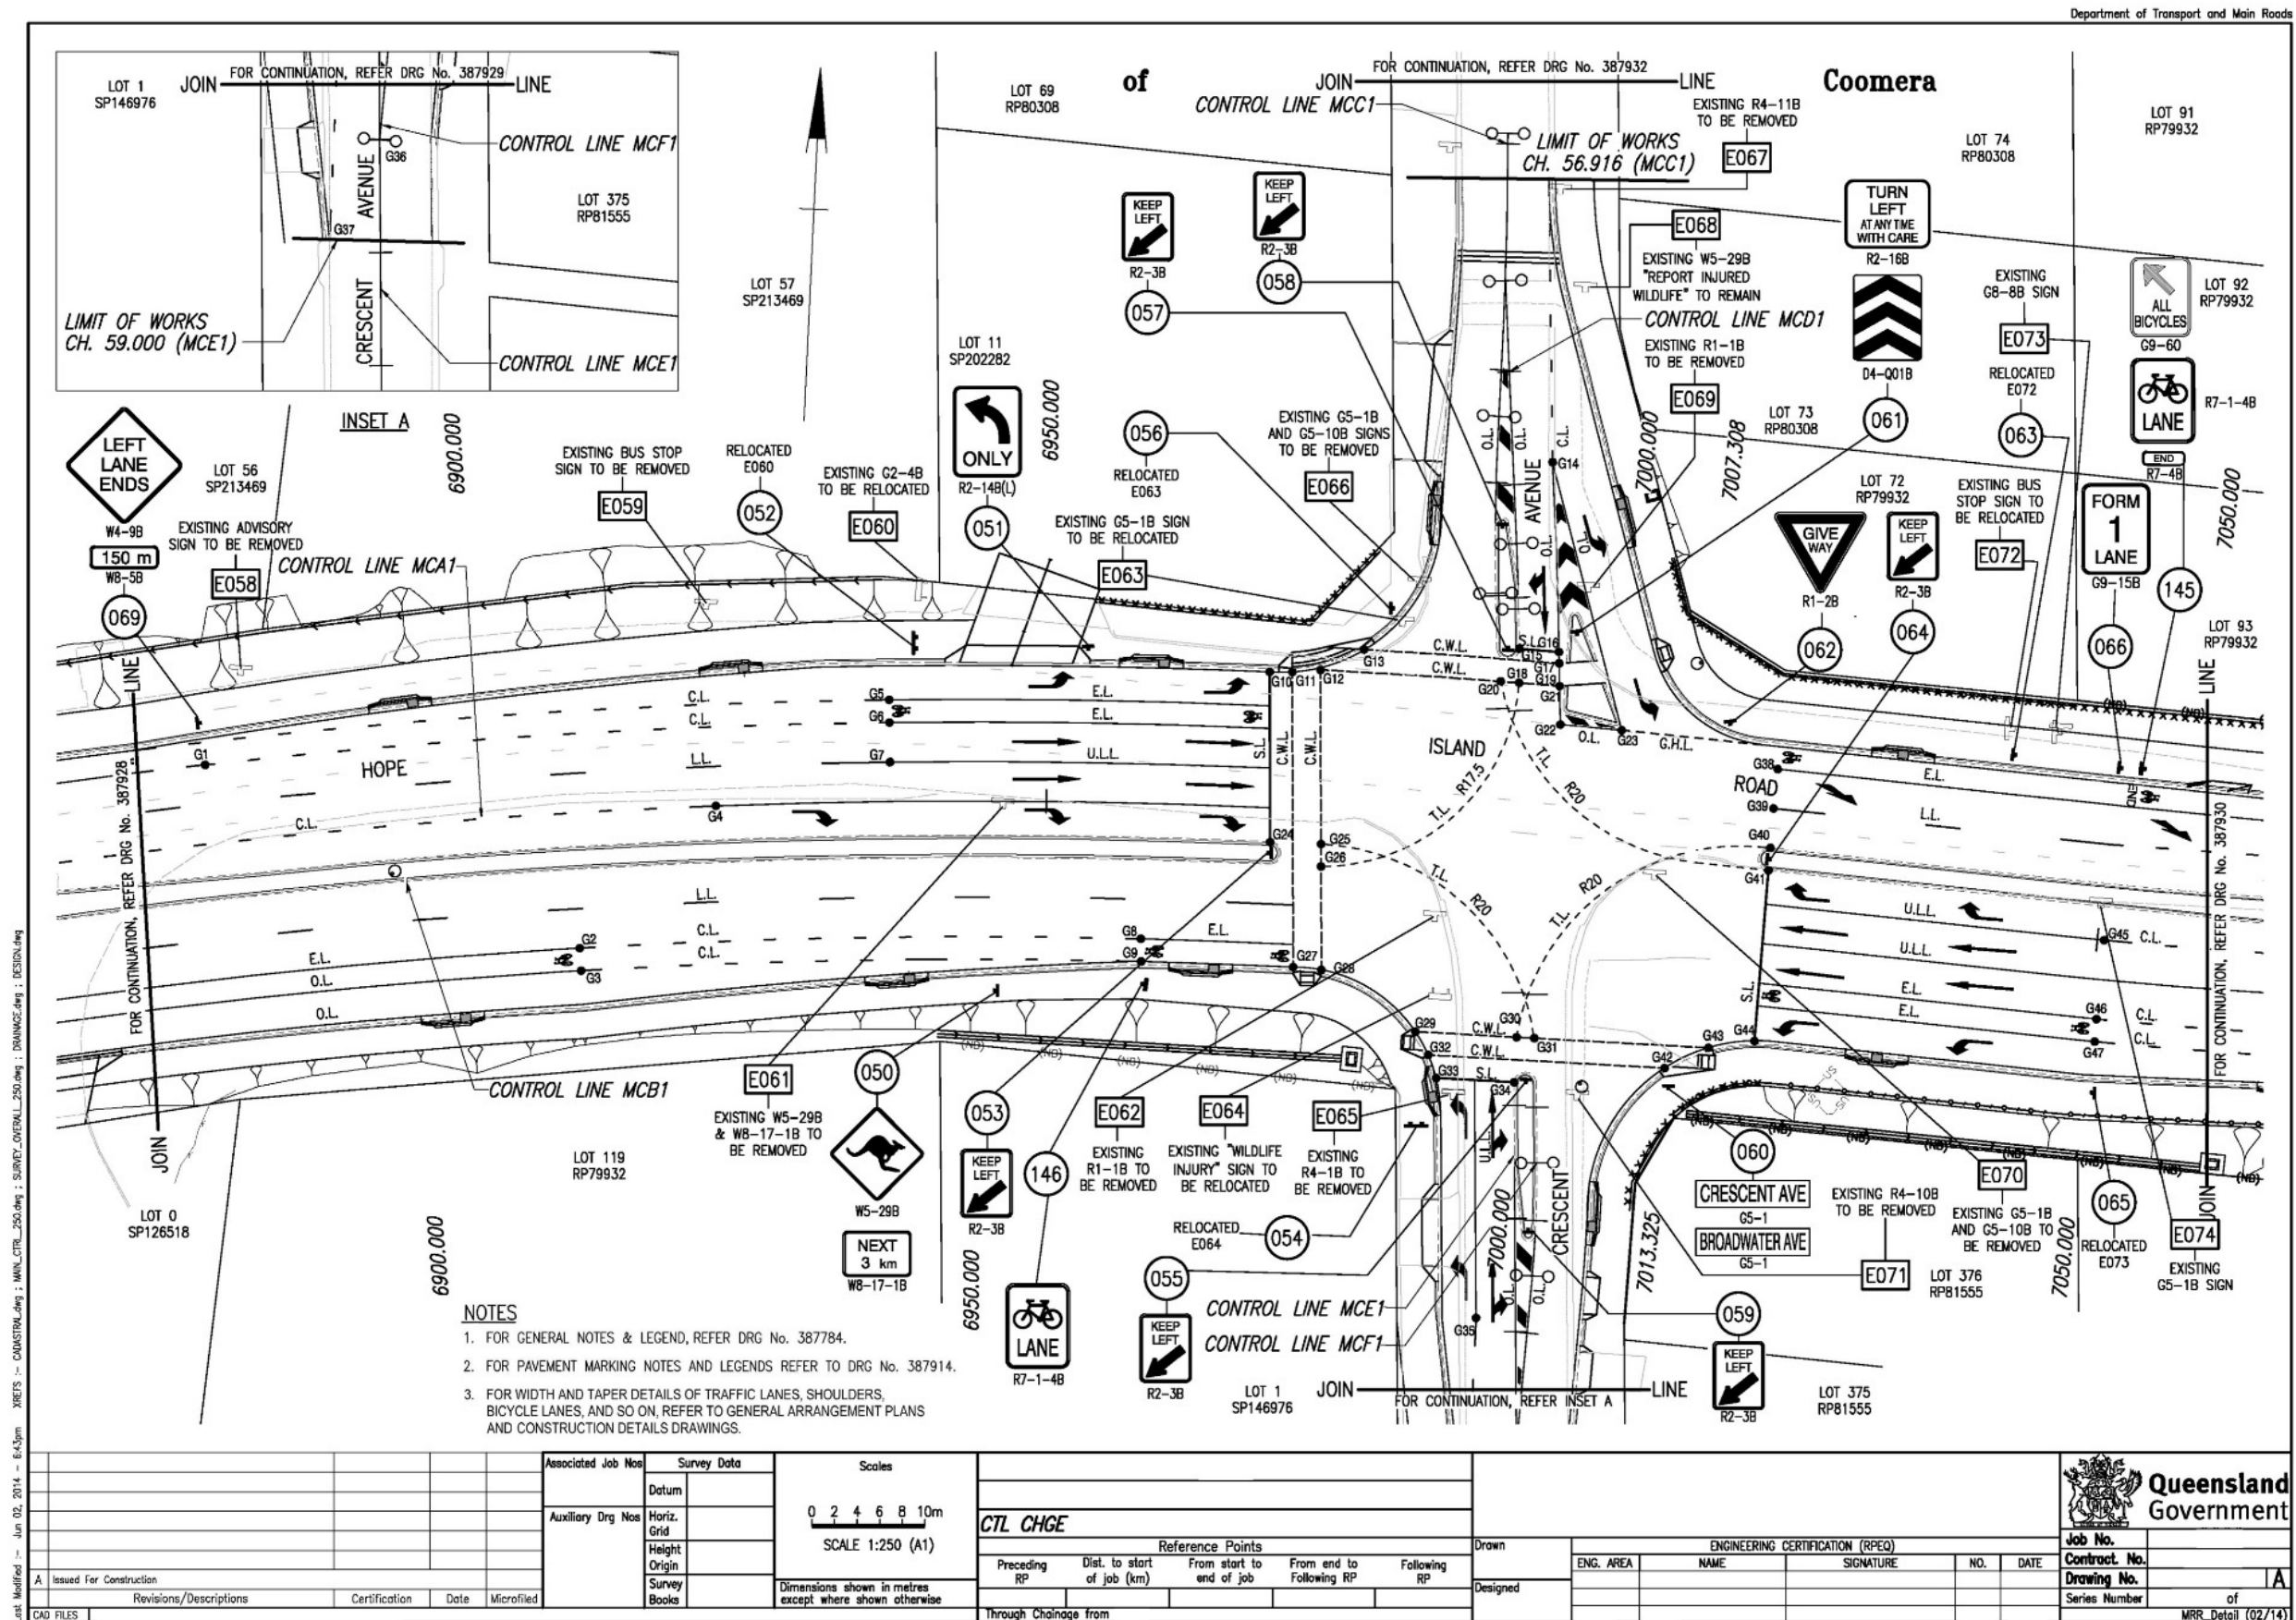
(d) – Pavement markings and signage – generic example 3 – sheet 2 of 3
